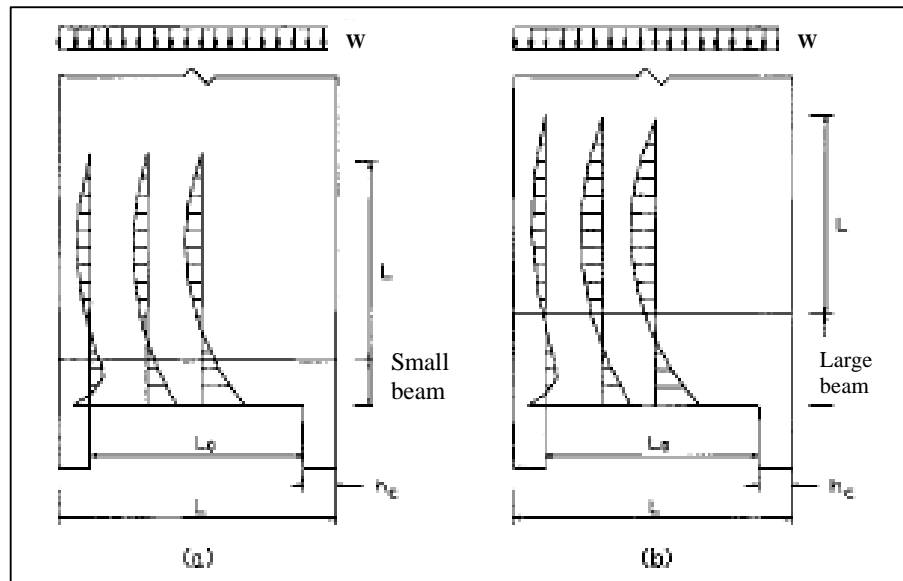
Distribution of horizontal stress in the wall-beam system
